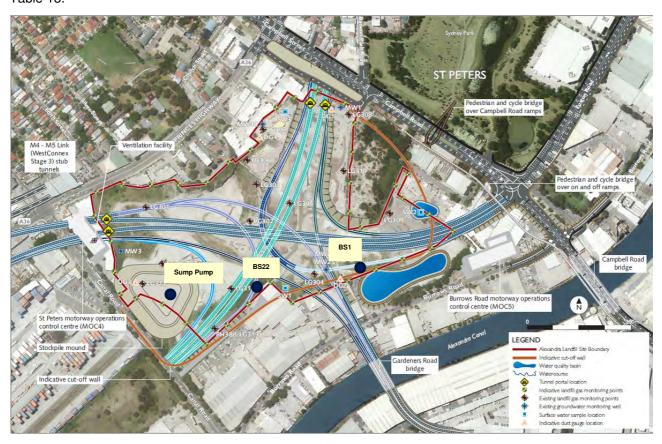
Alexandria Landfill Layout and Proposed Cut-Off Wall Alignment
